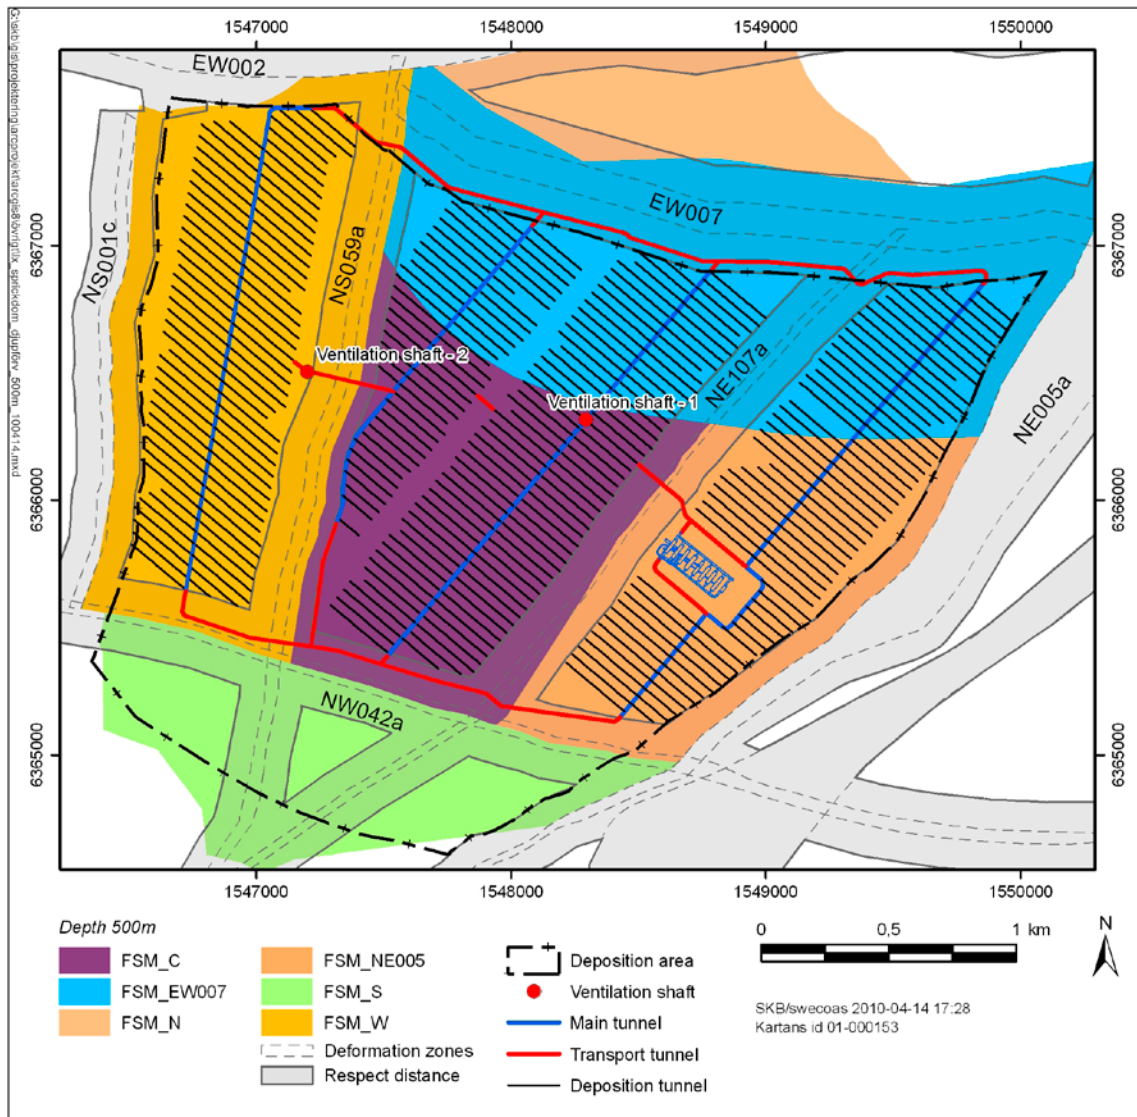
The complete proposed layout for the Laxemar site, including the deposition tunnels.
